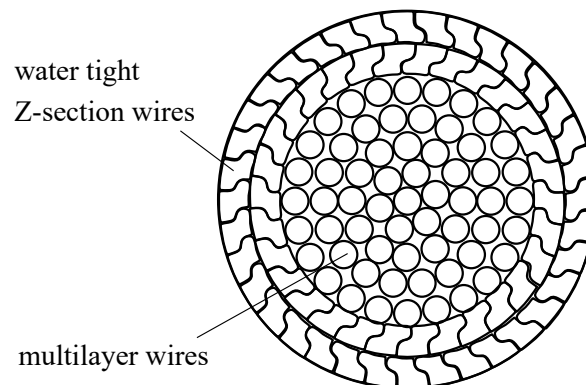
An example cross section of a medium sized Locked-coil rope cable.
